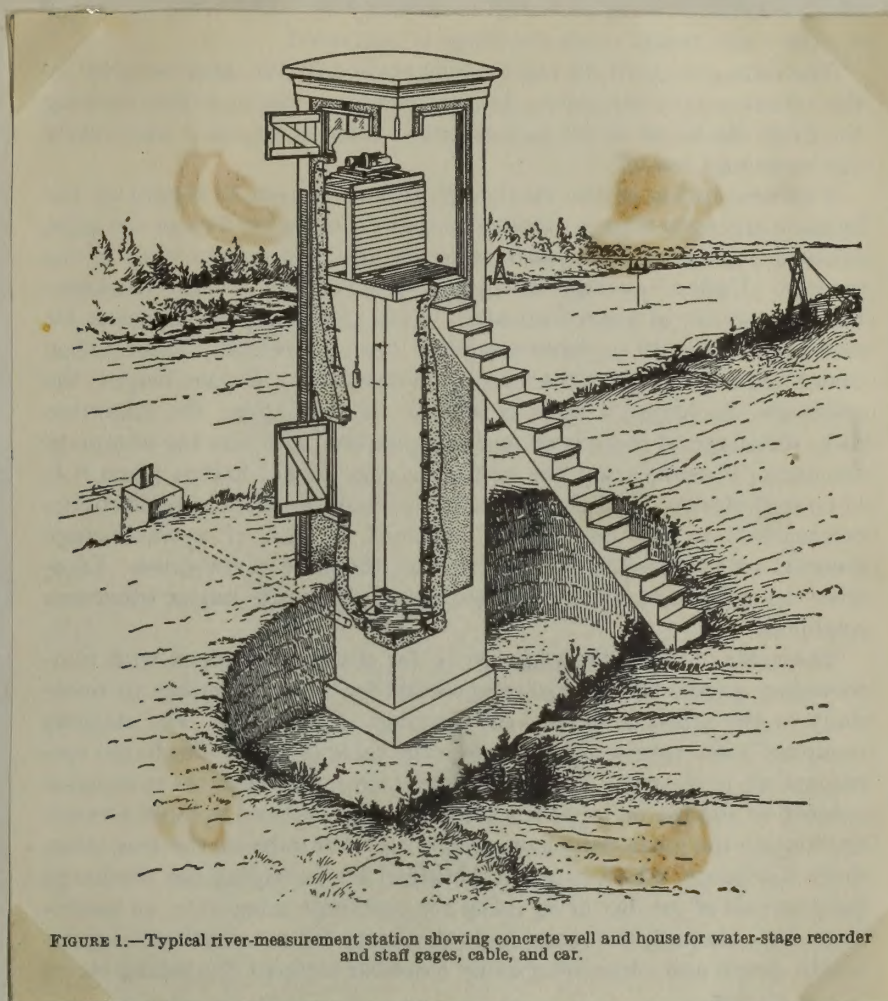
Typical river-measurement station showing concrete well and house for water-stage recorder and staff gages, cable, and car.
